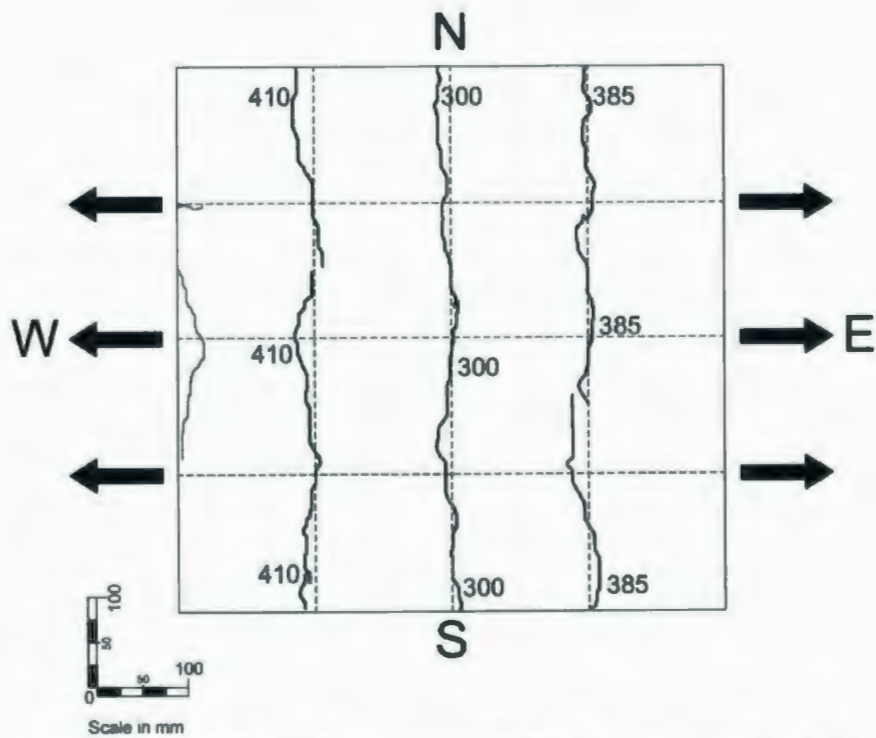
Stabilized crack pattern of panel P4-GHU-16-1.0-2.5
